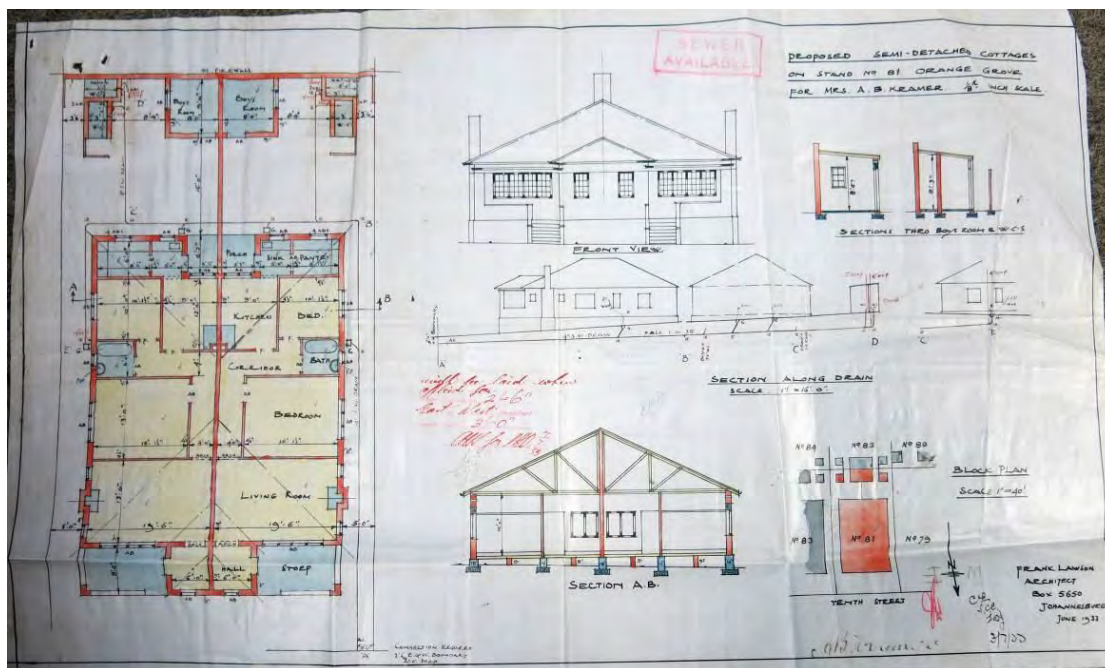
Plan for proposed semi-detached cottages, Stand 81
